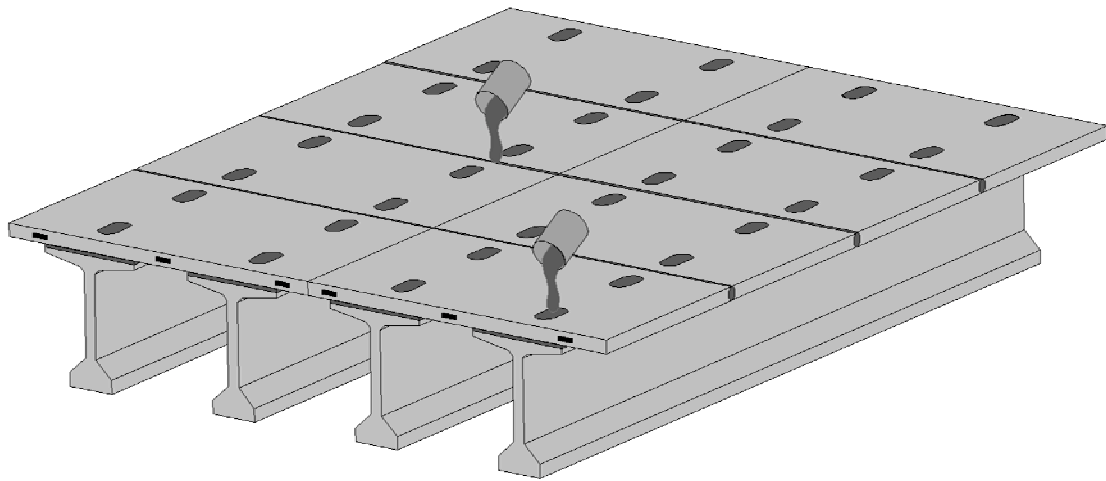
Full Depth Pre-cast Bridge Deck Panel Schematic
